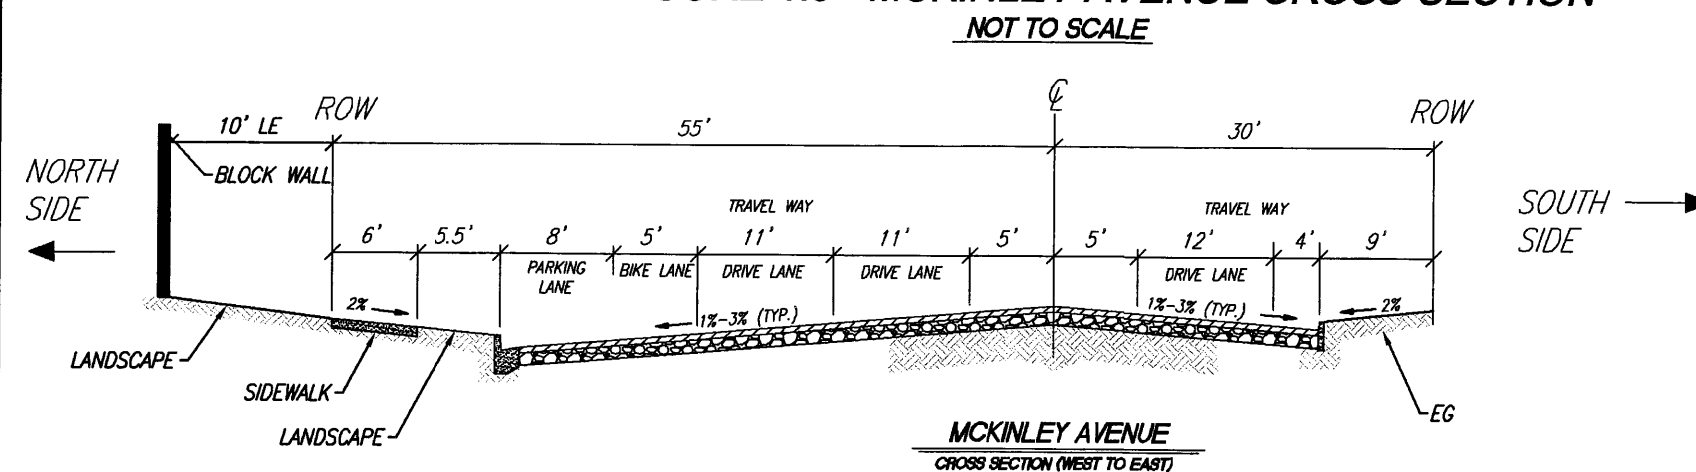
MCKINLEY AVENUE CROSS-SECTION
